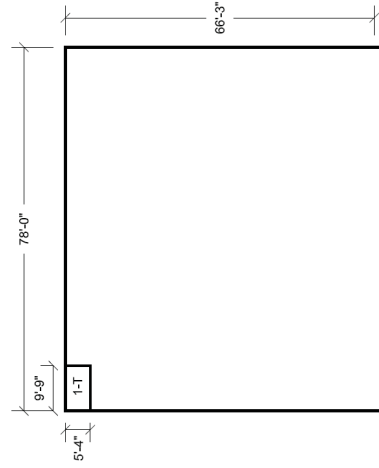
H.6-74A: PUMP HOUSE INTERNAL EAST WALL LOOKING WEST
